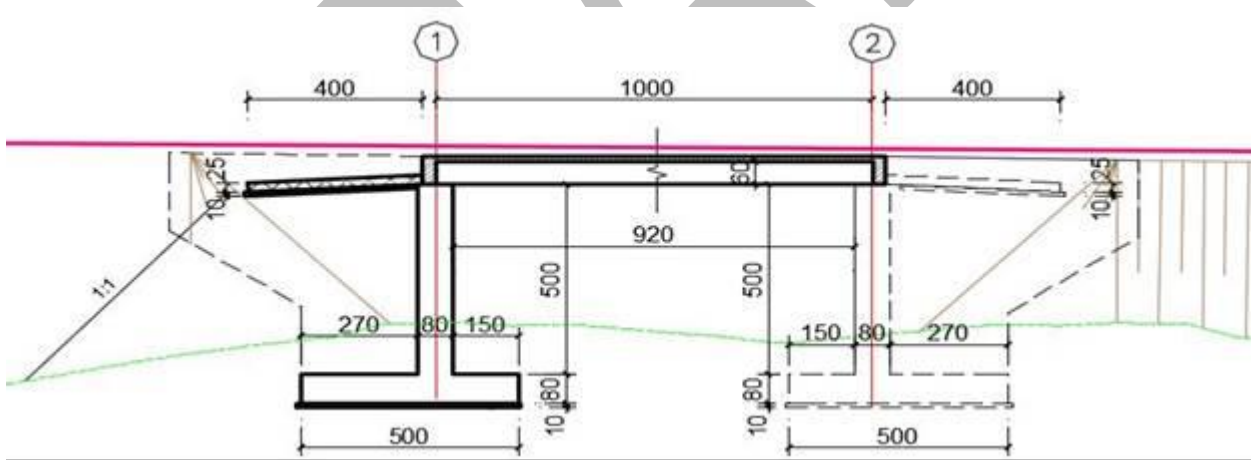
Typical cross-section for small single-span bridges with a length of 10m
